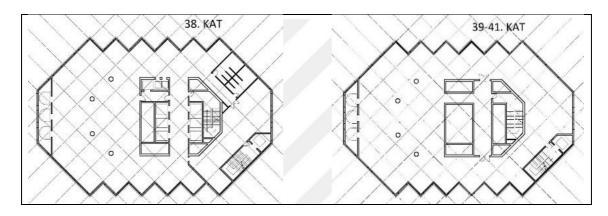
Thirty-eighth to forty-first floor plans of İş Tower
